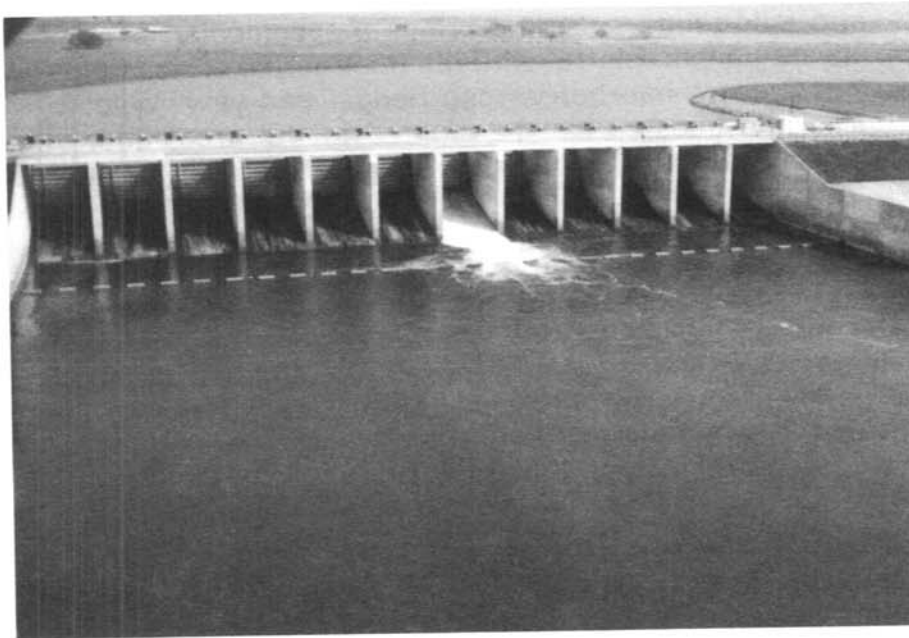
Palmetto Bend Dam, Texas. Aerial view of the
